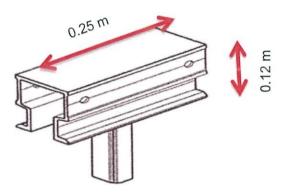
Prop Head for Soffit Beam Source: architectjaved.com (n.d)
